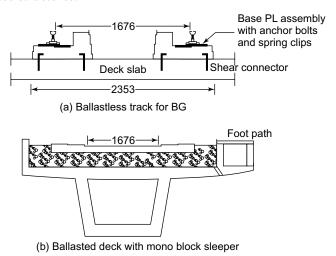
(b) Ballastless and Ballasted Tracks on Elevated Structures
